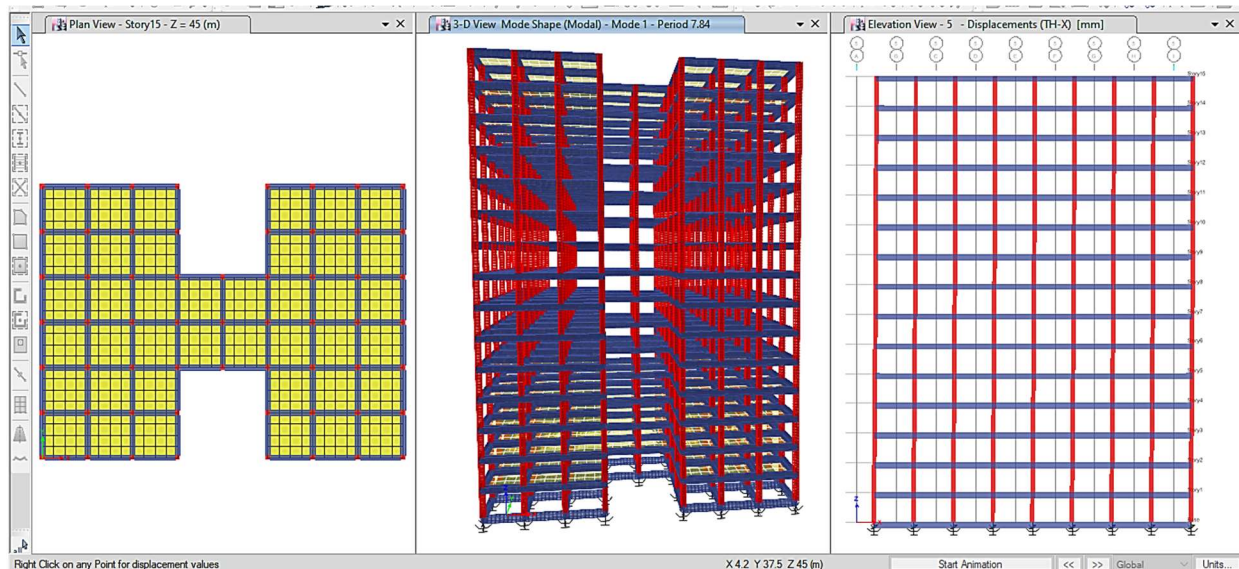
Plan, 3D & Elevation view of FPS base H-shaped plan building
